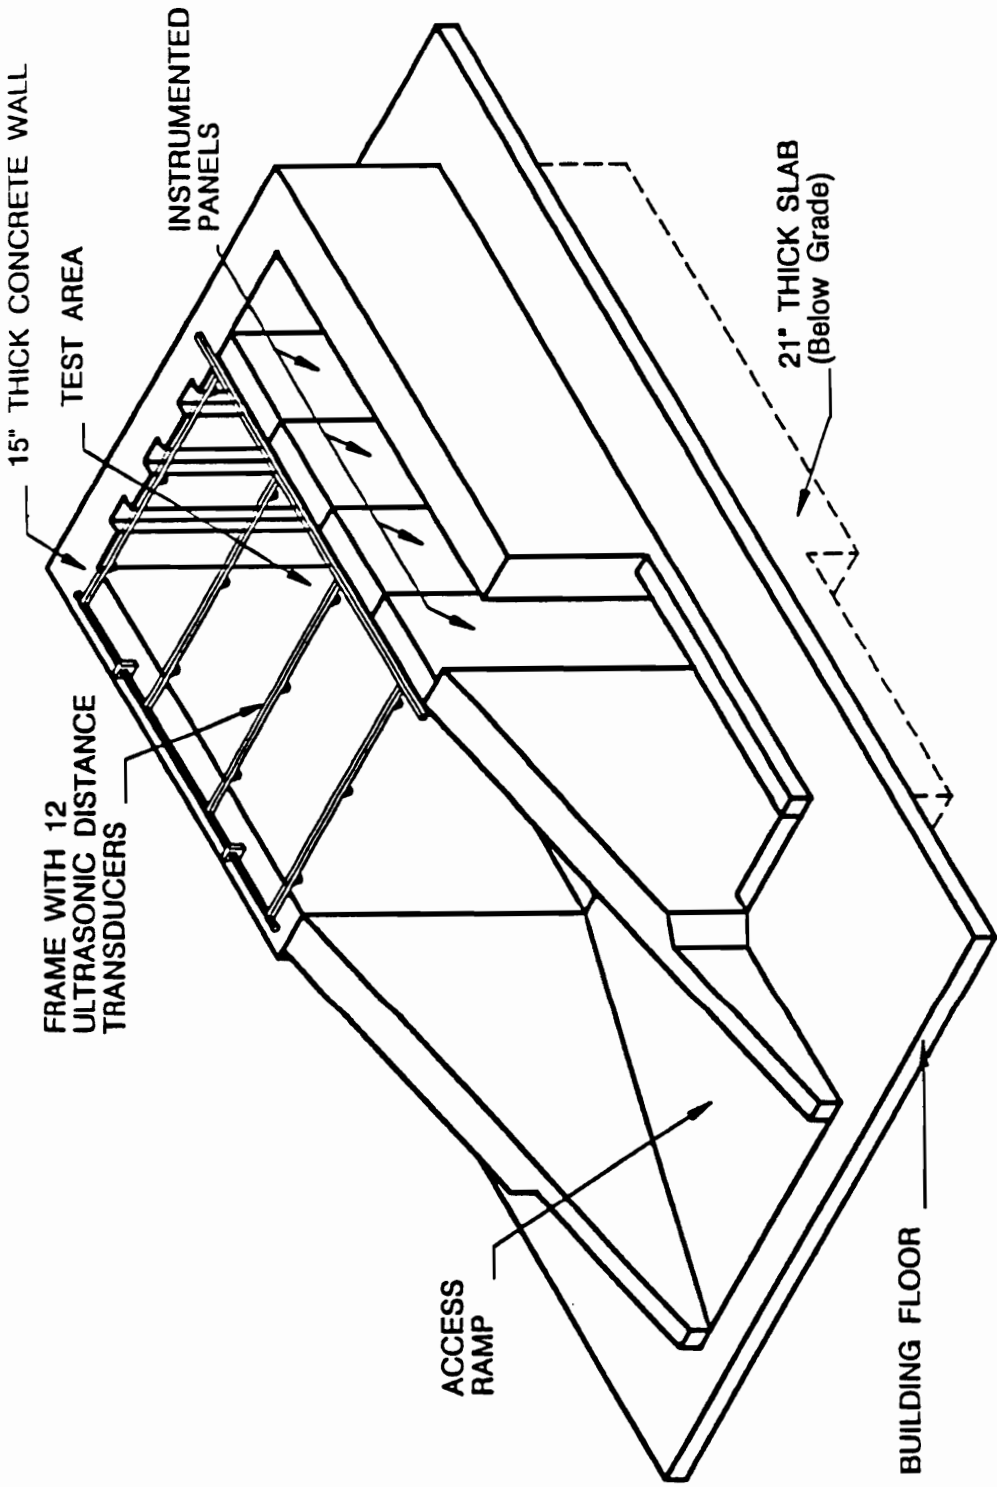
The Virginia Tech Instrumented Retaining Wall Test Facility (after Sehn and Duncan, 1990)
